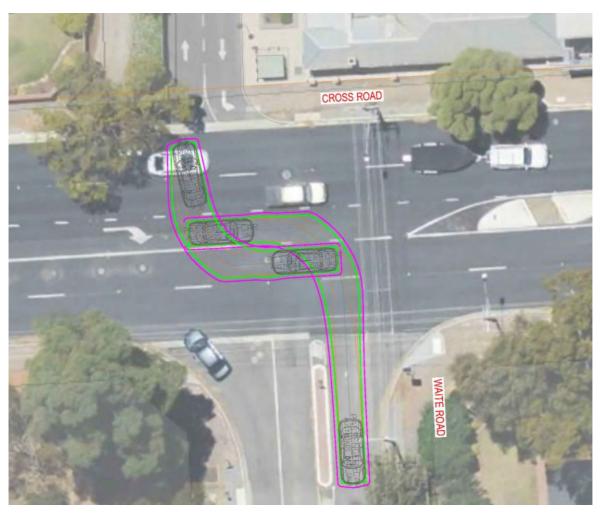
Potential conflict for drivers turning right to the site and to Waite Road
